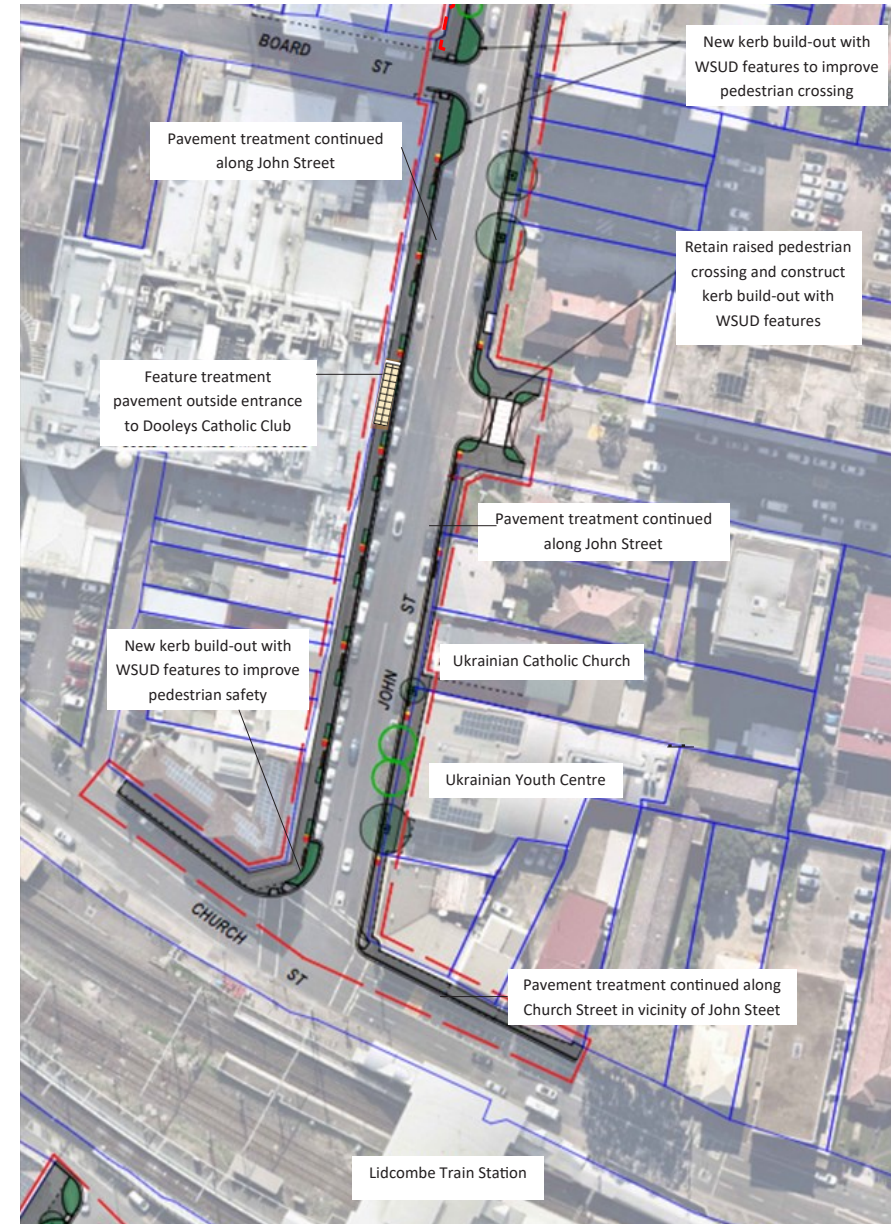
John Street Precinct Concept Plan (Church Street to Board Street)
